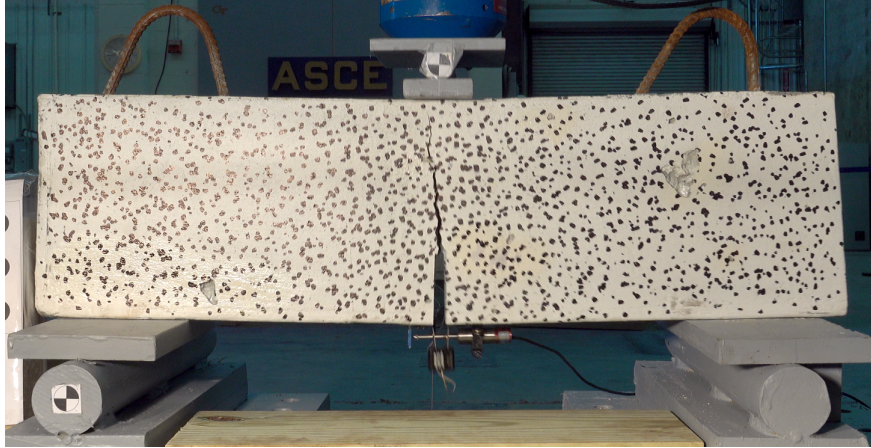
Three-foot “as-built” unreinforced concrete beam behavior.
